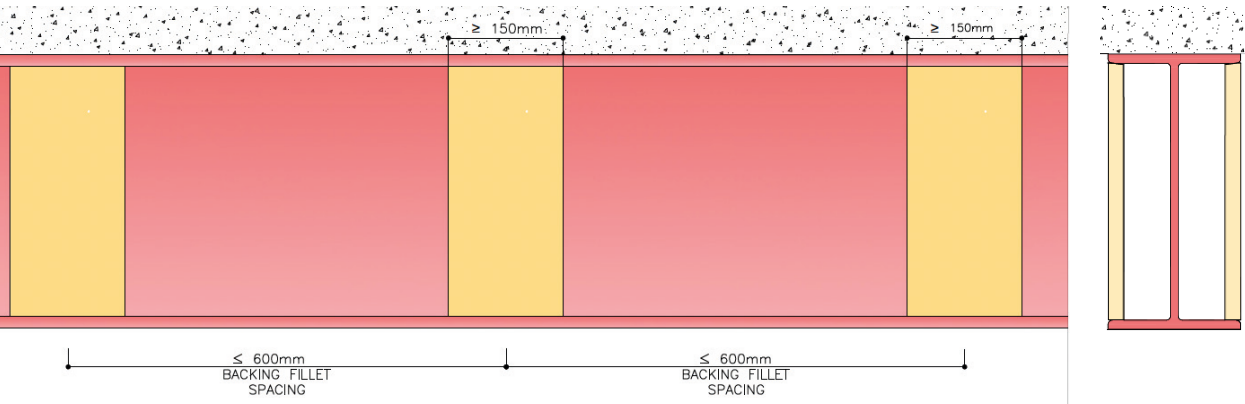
Elevation and cross-section view of Universal Steel Beam, showing location of Knauf Fireboard Fillets
